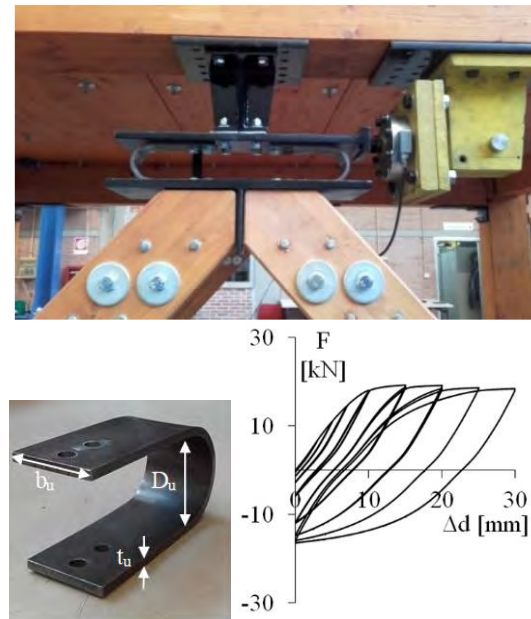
Construction detail between the dissipative bracing and beam, detail of UFP1 and constitutive law.
